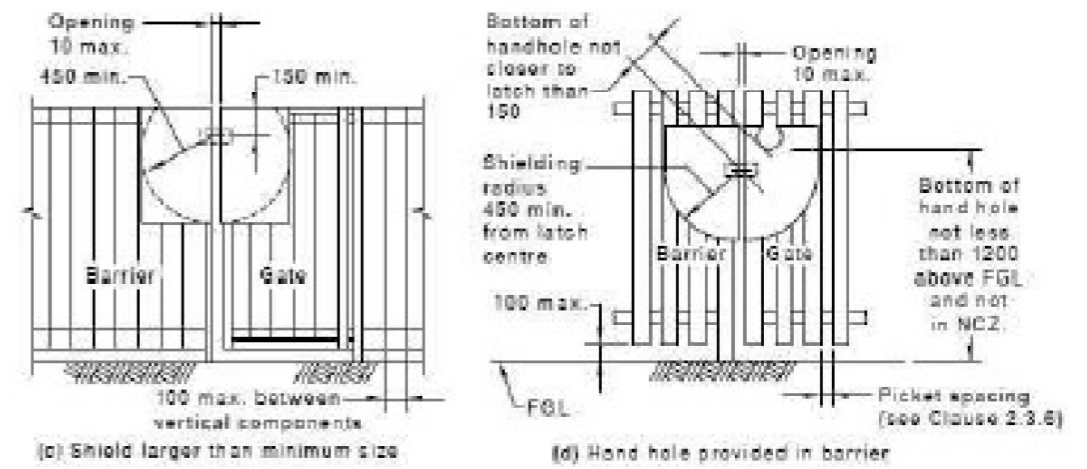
(in part) PERPENDICULAR BARRIER DIMENSIONS
